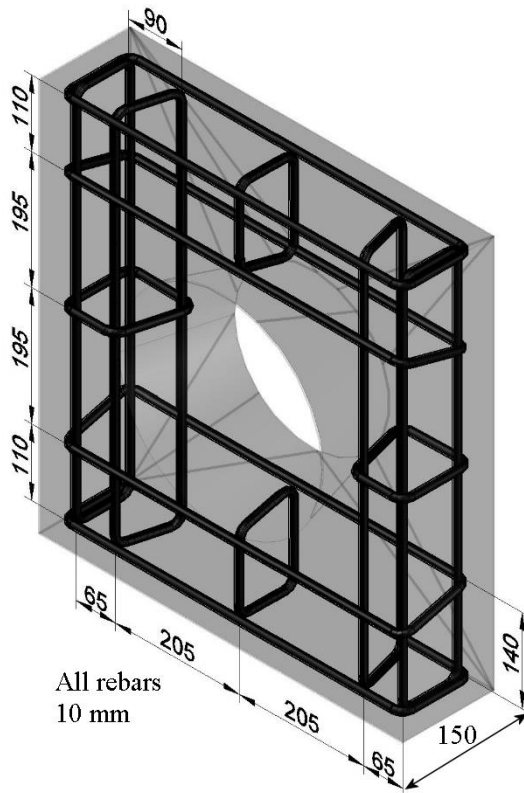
Reinforcement details of LNSC pushout Test 1 and 2
